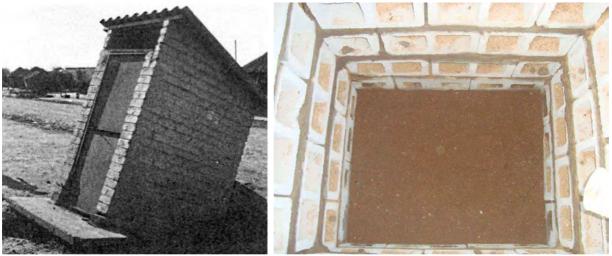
Left: An unlined or unreinforced pit cannot support a heavy top structure. Right: A pit lined with blocks laid with open vertical joints, allowing drainage through the bottom and sides of the pit.
